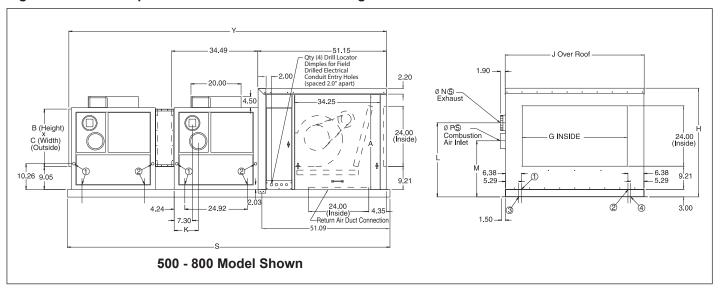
DCS Separated Combustion Cooling Package Unit Dimensions
